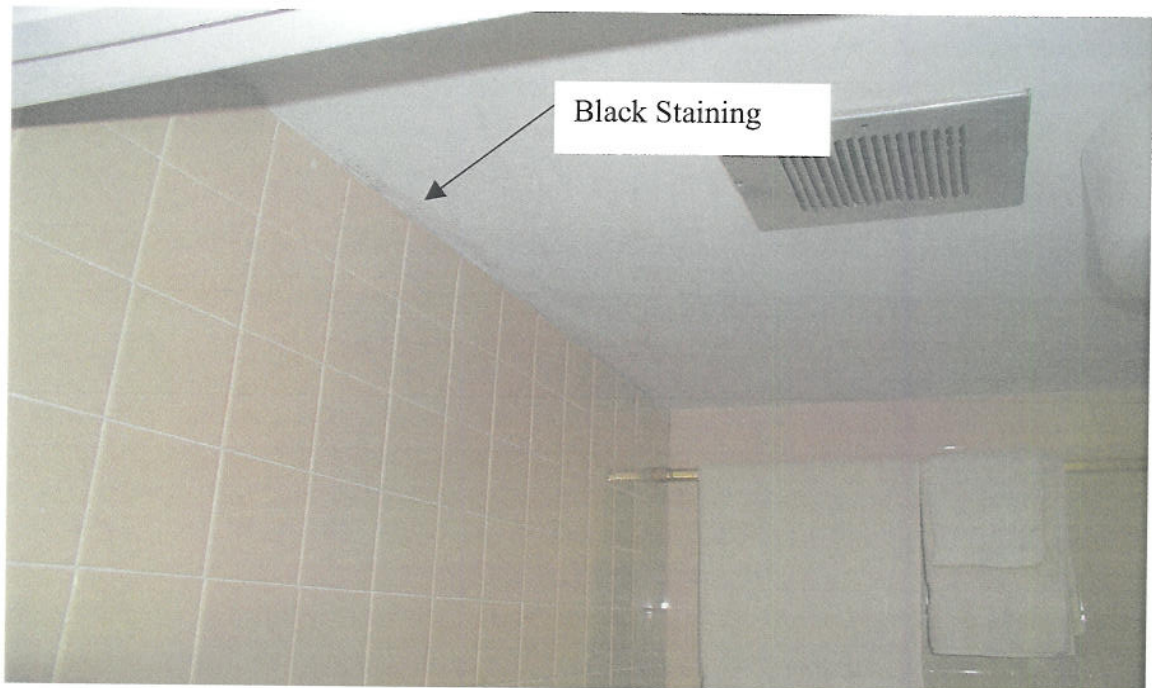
Minor black staining indicating potential mould along ceiling in bathroom.
